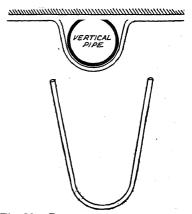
PASSOVER BEND FOR CROSS-ING VERTICAL PIPE First make the centre bend almost a hairpin shape.
